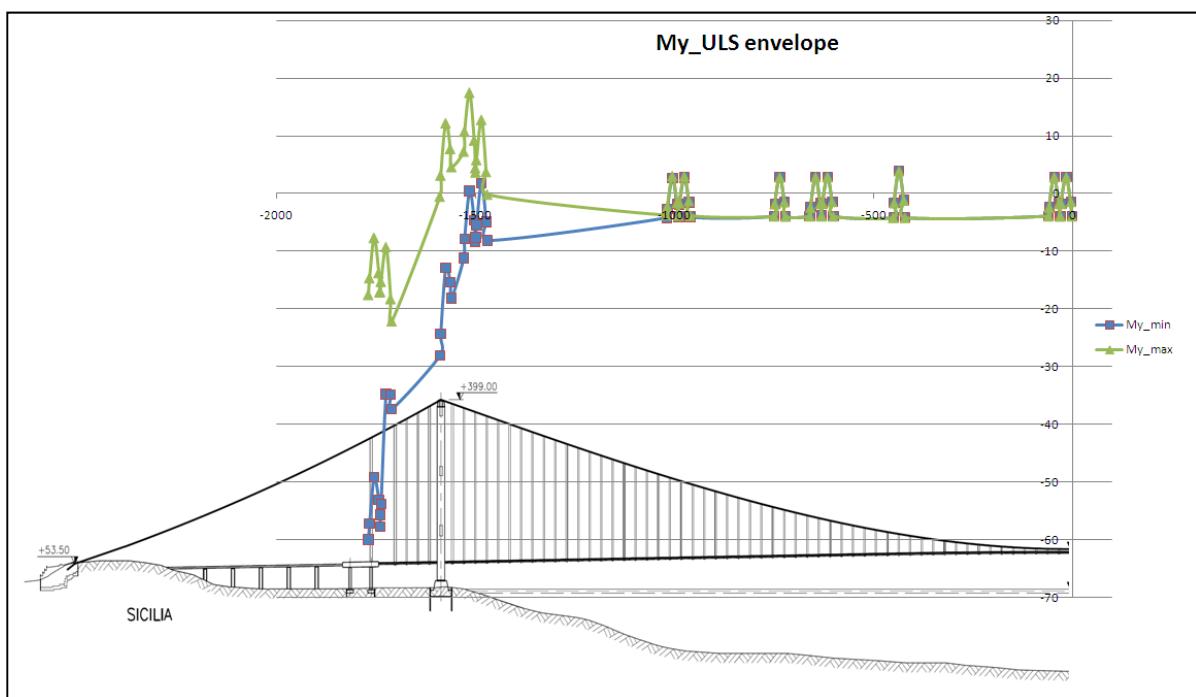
Sectional forces in rail girder for rupture of hanger 5, Moment (MNm)
